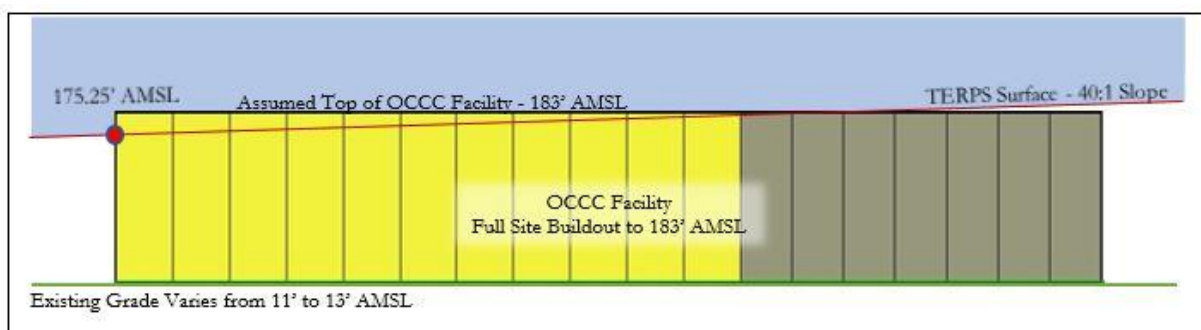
TERPS Surface Profile with Full OCCC Facility Built to 183 Feet MSL
